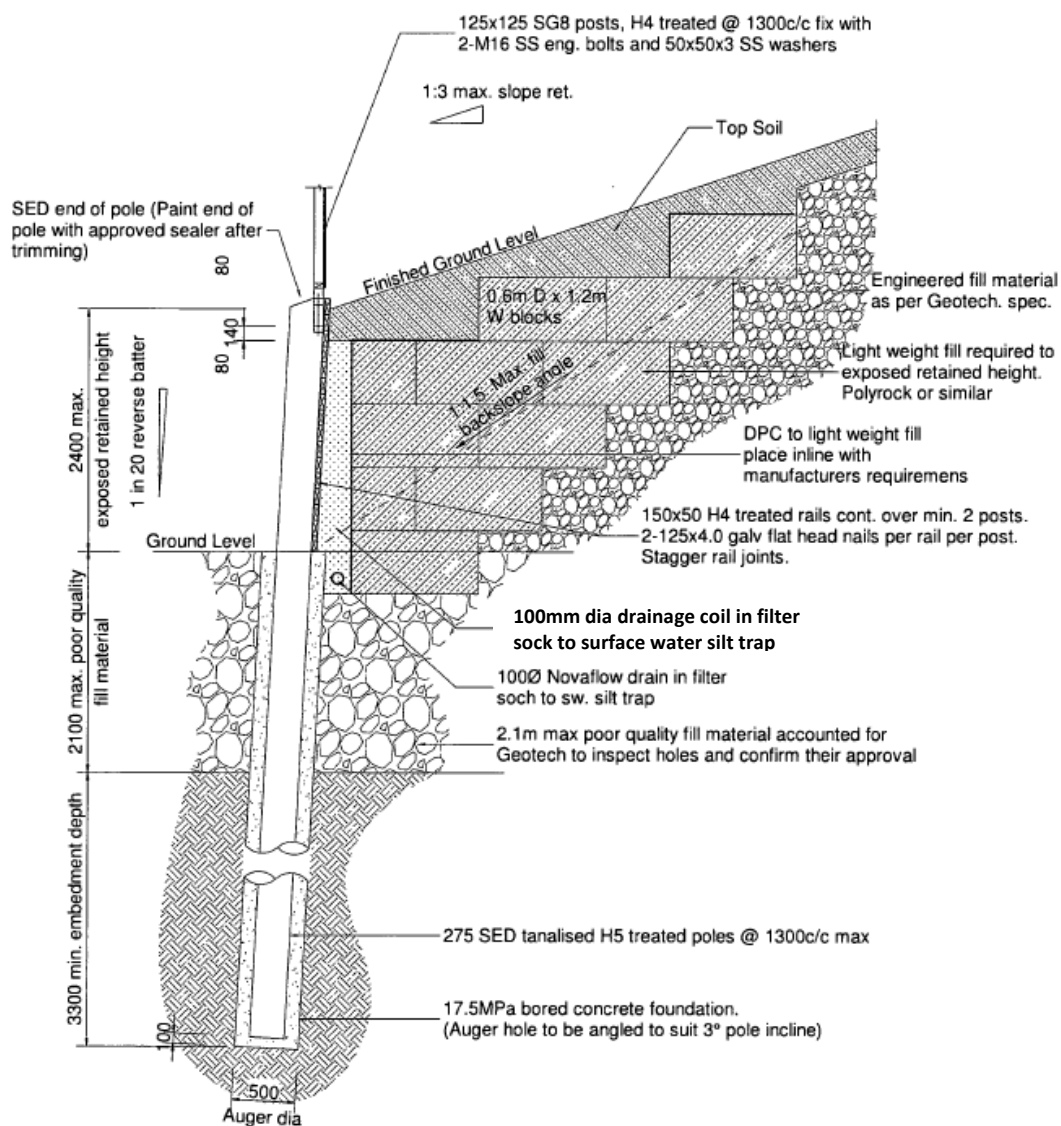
The Type 3 retaining wall (not to scale).²⁴
